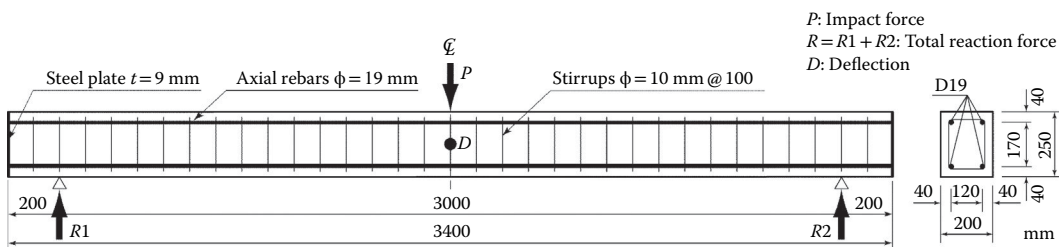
Dimensions and reinforcement layout of RC beam (1 mm = 0.04 in).
